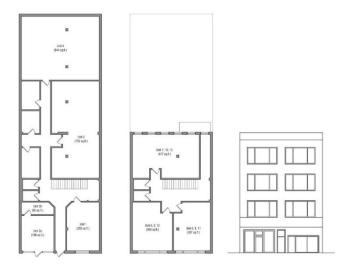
, 76, 77 (left to right): Building 2, first (ground) floor (1927); floors 2–4 (1927); street-front elevation (1979). For plans, north is up.
